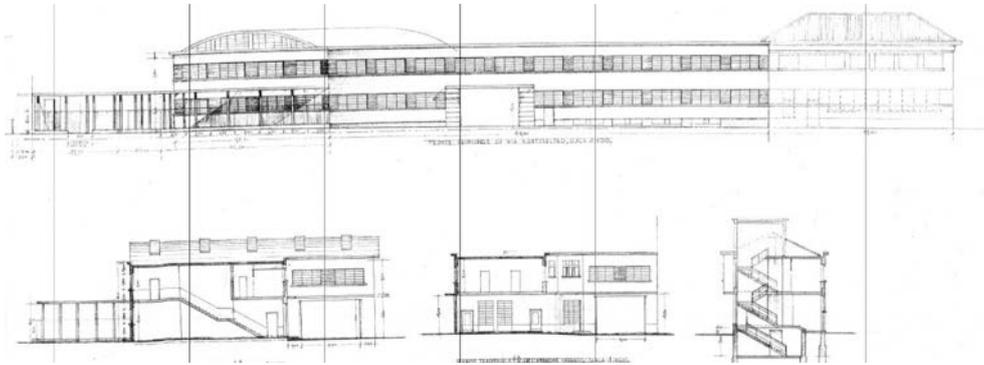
Current Elevations and Sections The OSI Ghia Offices Building
